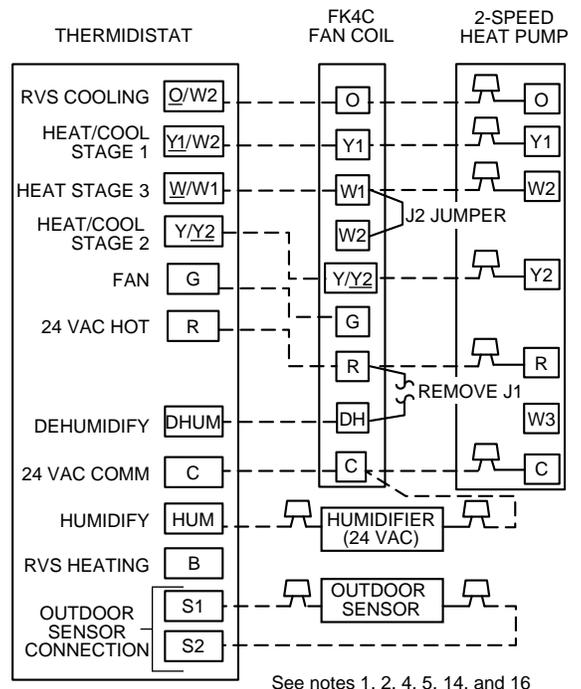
FK4C Fan Coil With 2-Speed Heat Pump
